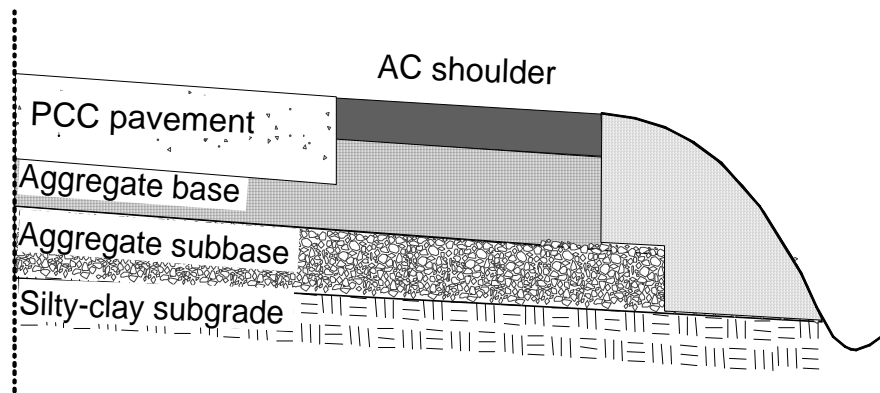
Typical undrained PCC pavement section (ERES, 1999).
